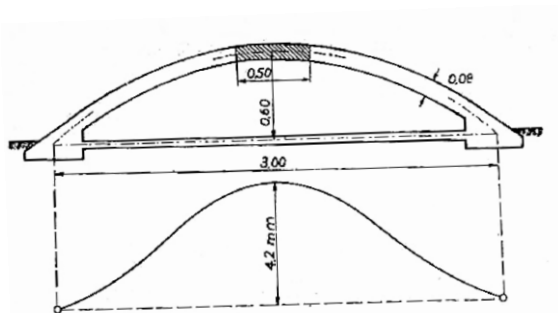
Vault with expansive concrete in keystone (Möll, 1954)
